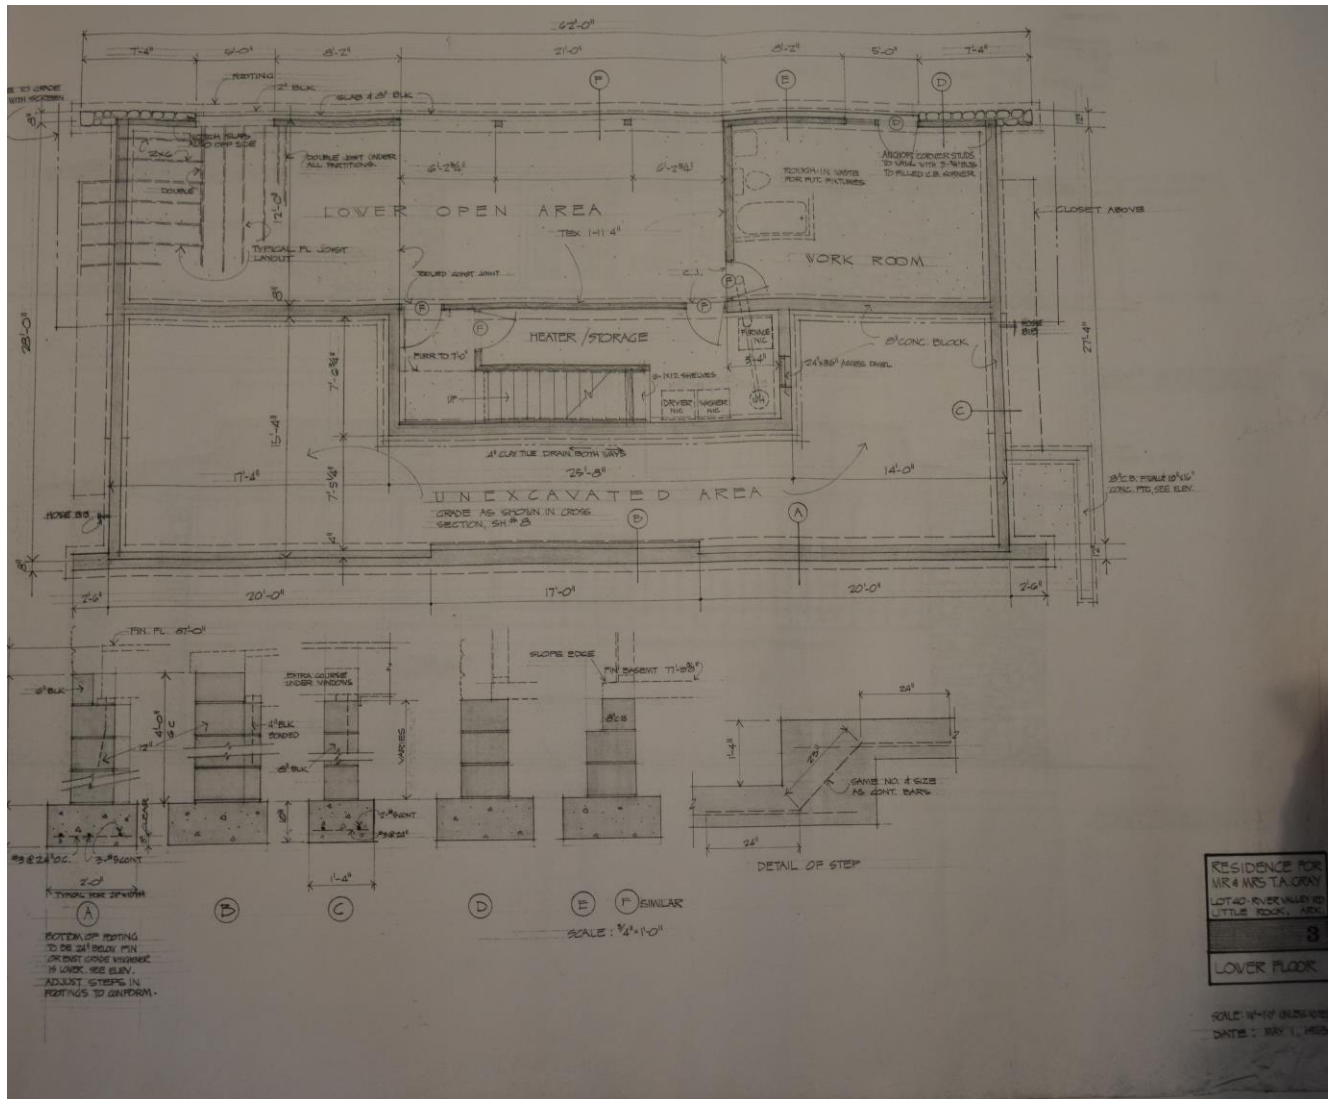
Lower Floor plan of the Thomas Gray House, 1963.
